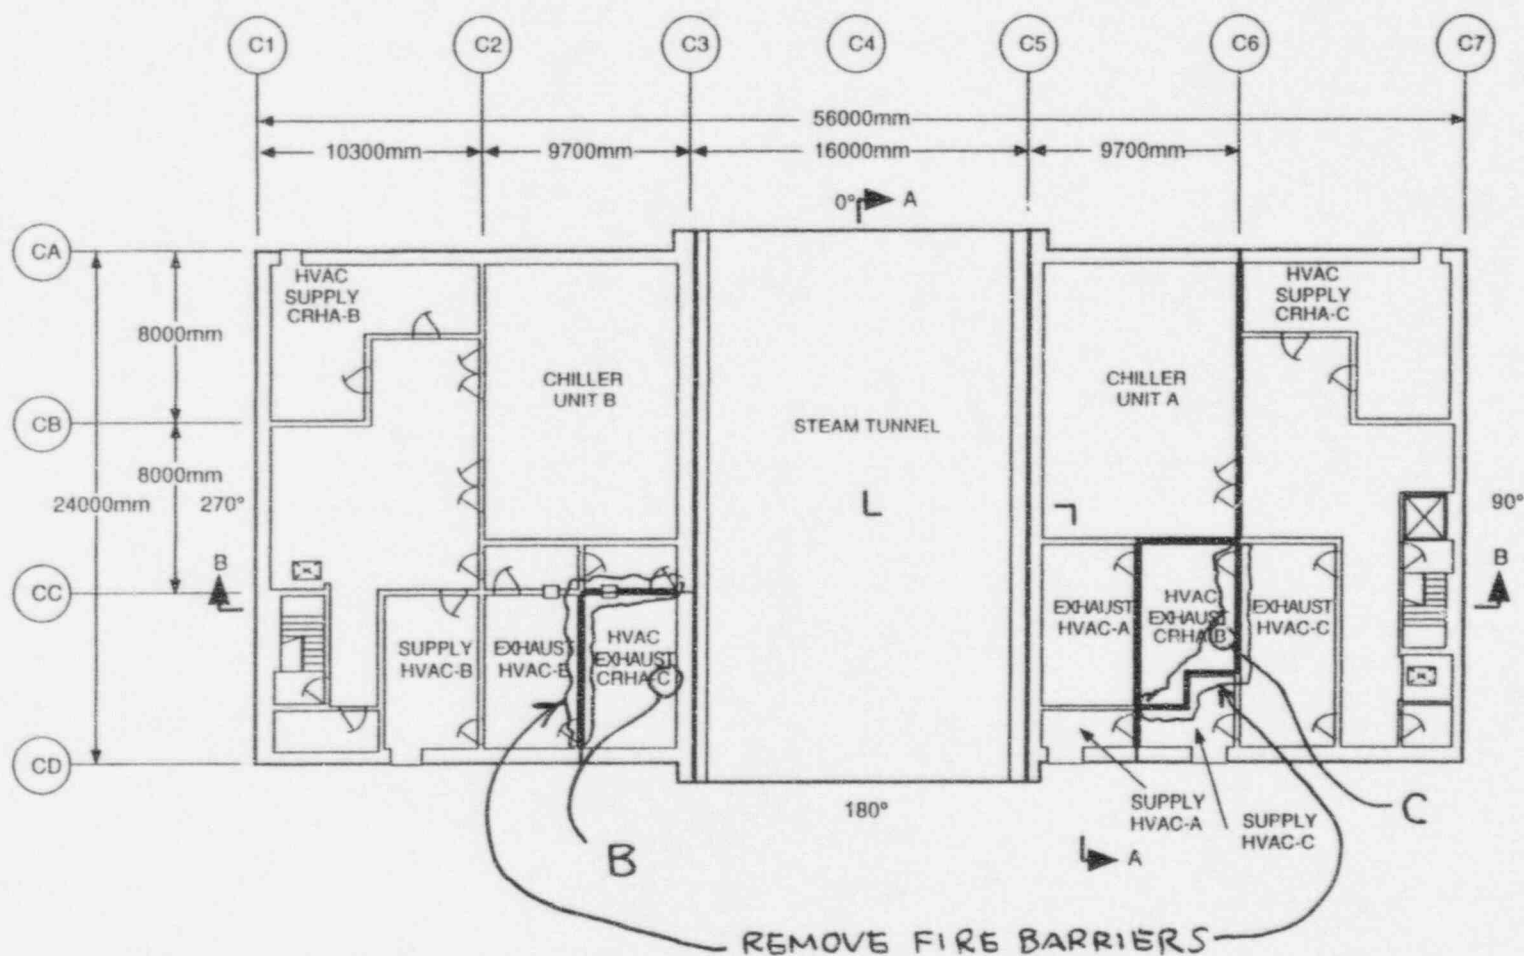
Control Building Arrangement, Floor 2F—Elevation 17150 mm
